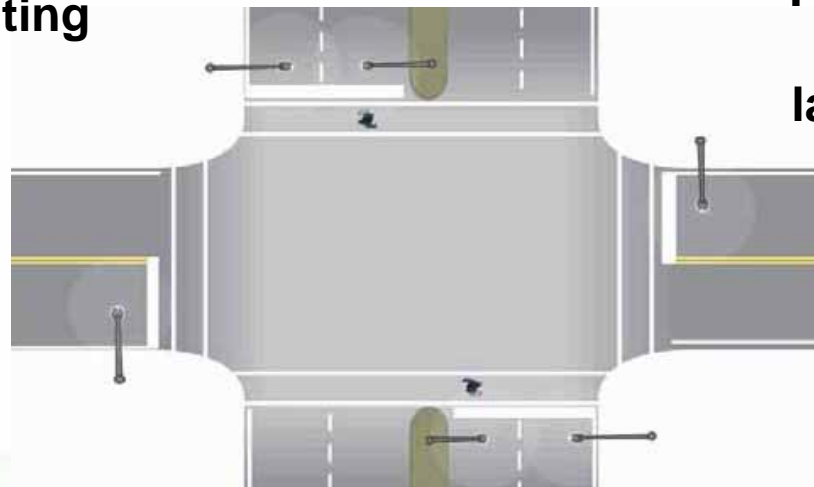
New design for wide roadway intersection lighting layout for crosswalks
